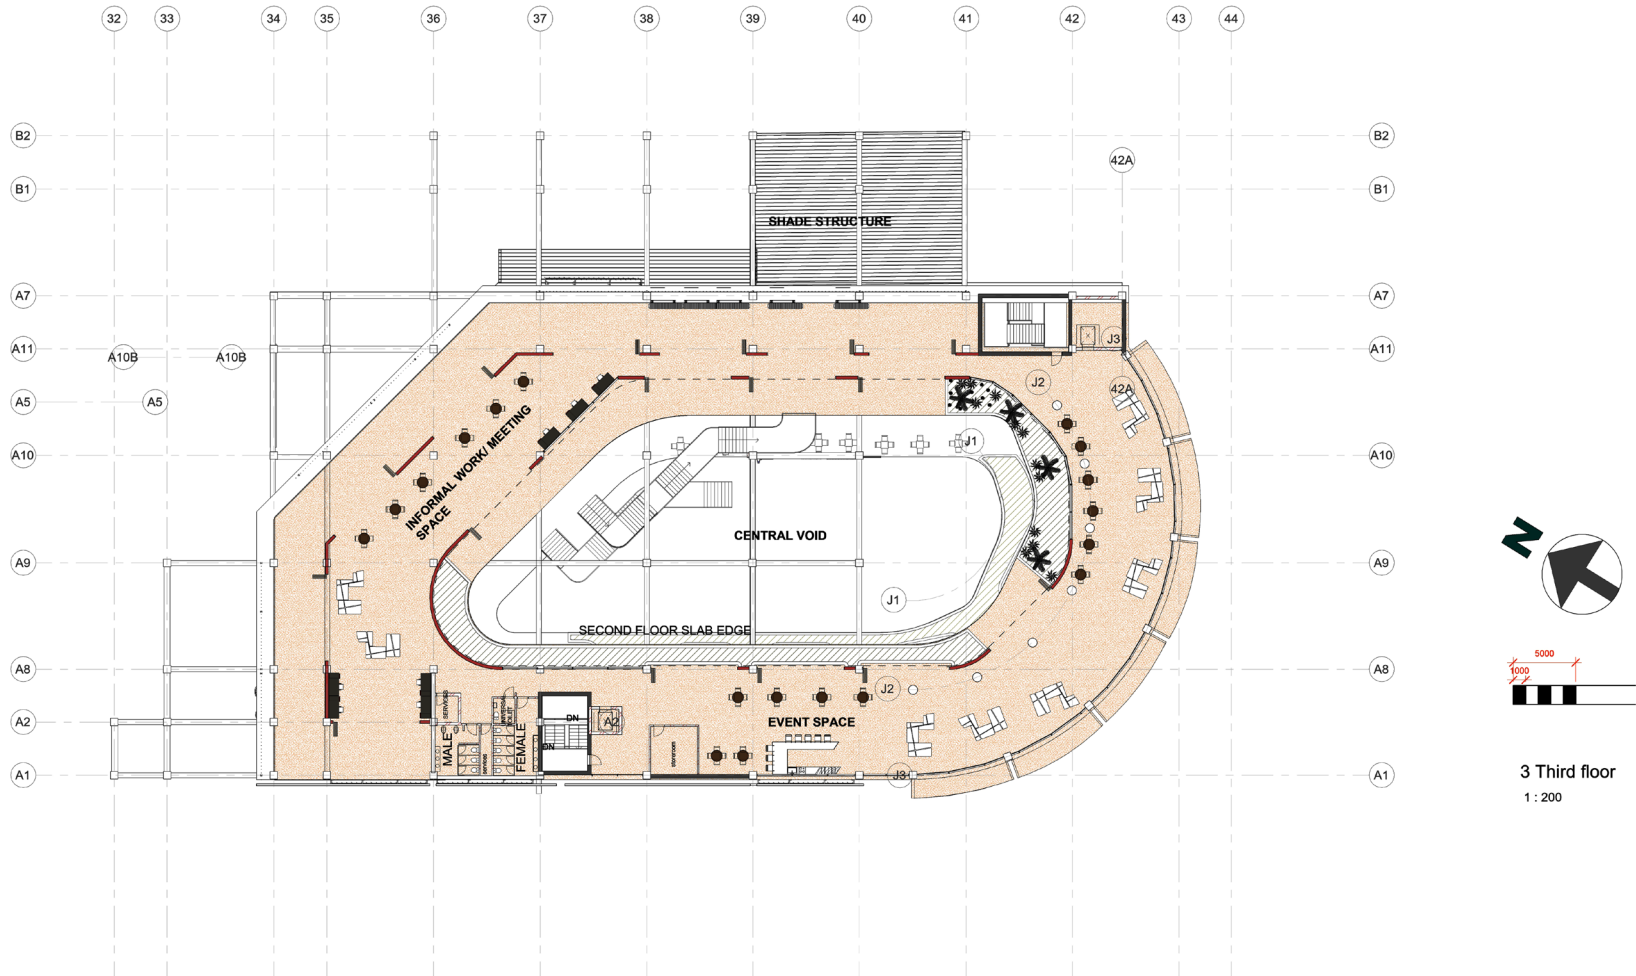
THIRD FLOOR STRUCTURE AND OPENING (AUTHOR 2021)
